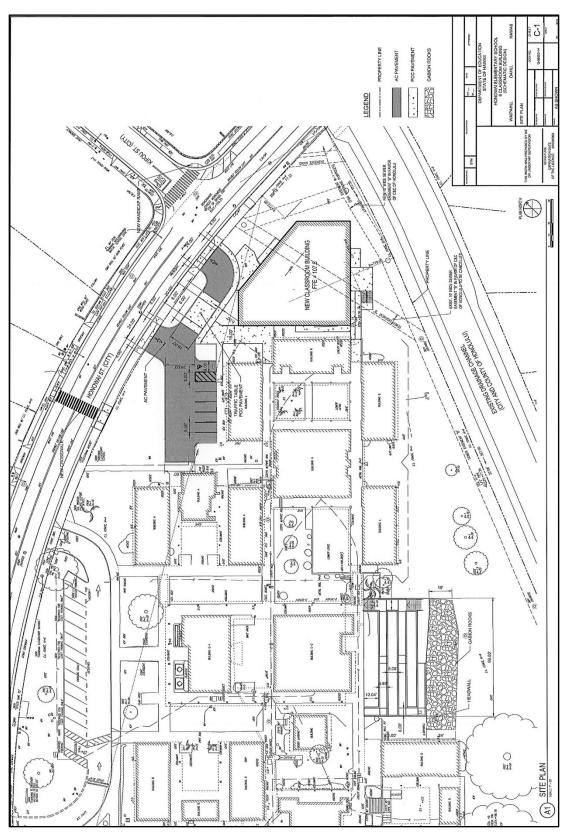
Site plan for the Honowai Elementary School Eight-Classroom Building project (courtesy of client)
